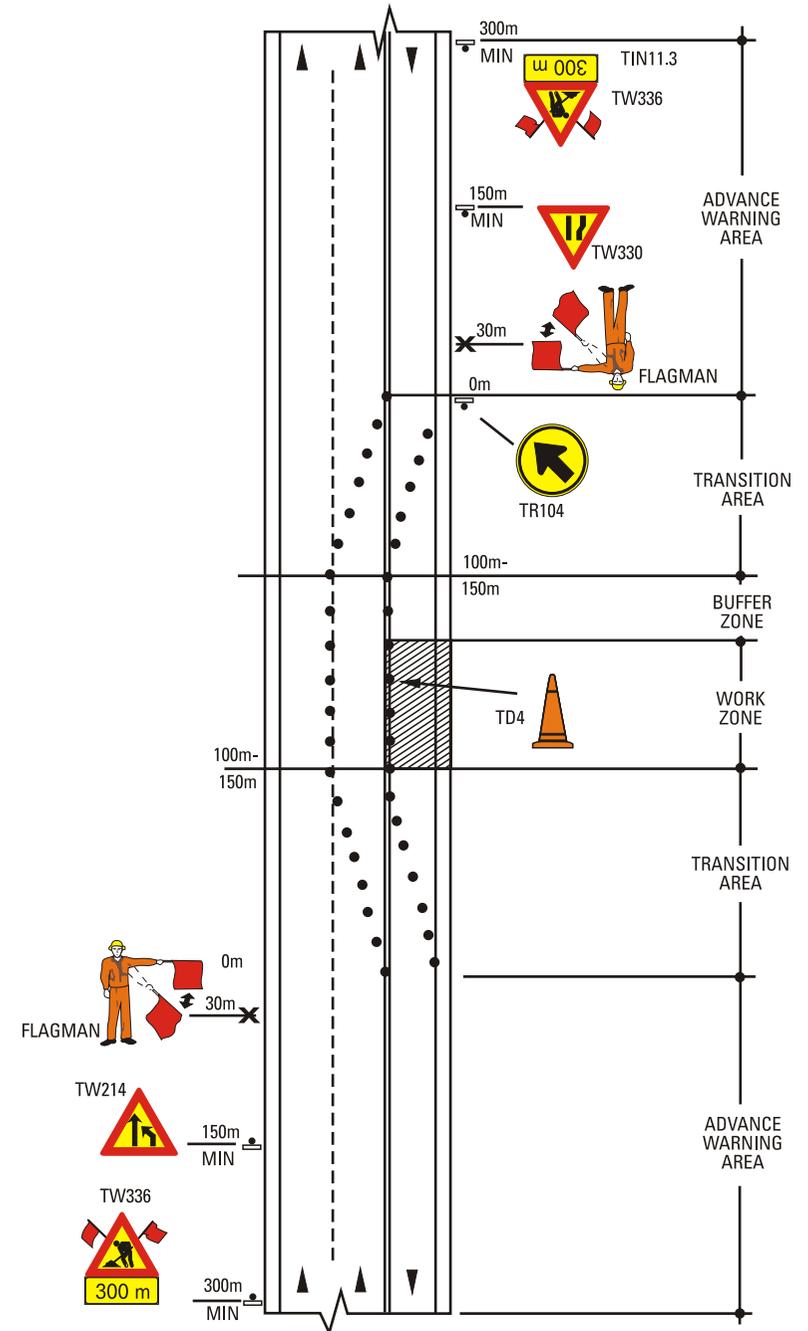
Short Term Lane Drop within Deviation - Work in Single Lane Section
